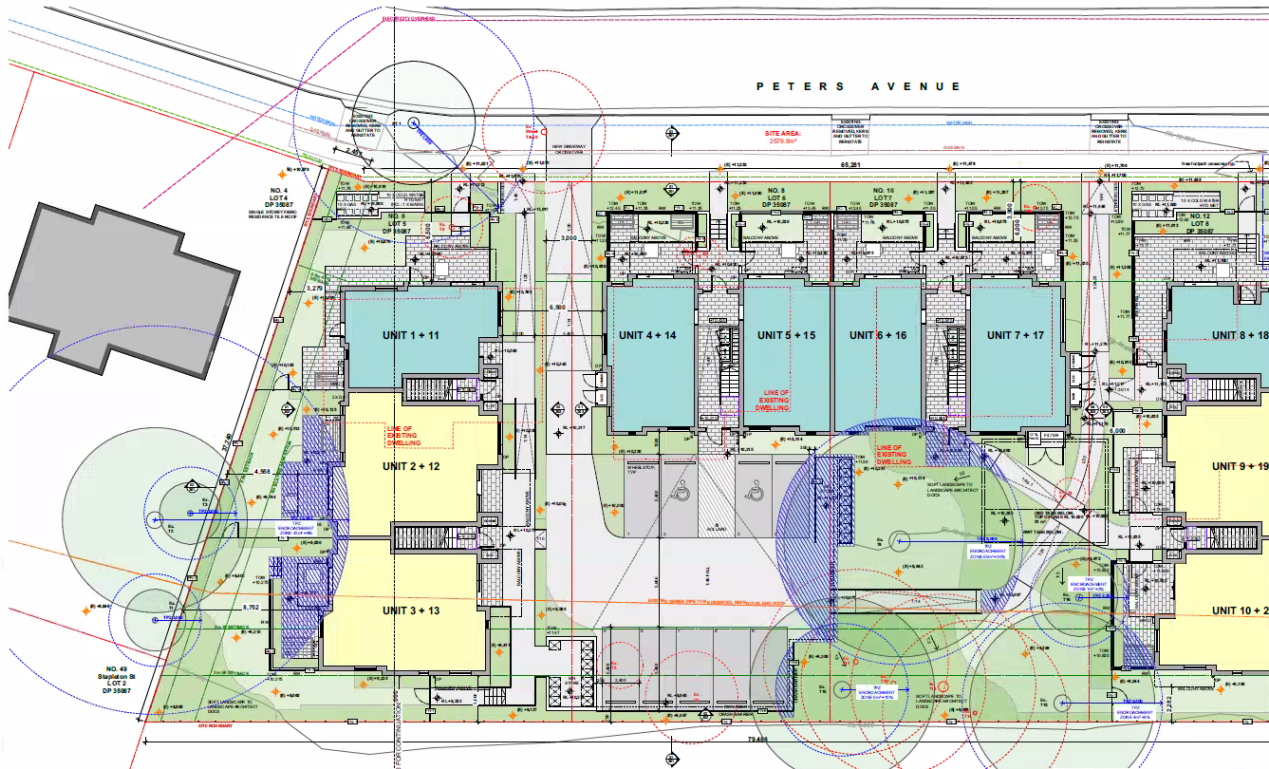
Extract from Architectural Plans – Site Plan (Source: Sam Crawford Architects)
